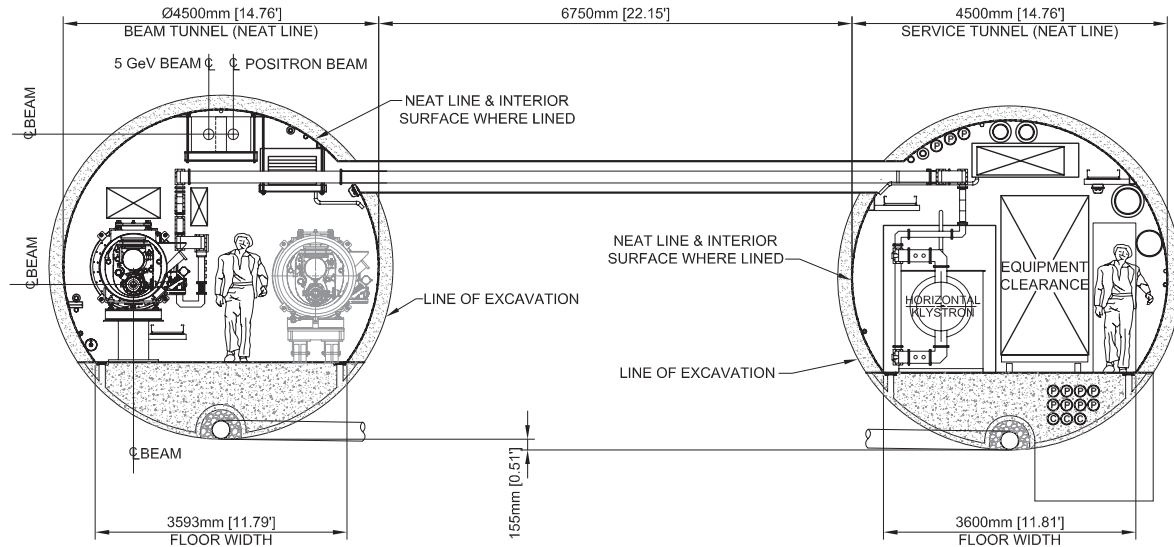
Cross-section of the Main Linac housing (Beam Tunnel, left) and Service Tunnel, showing the connecting waveguide penetration.
